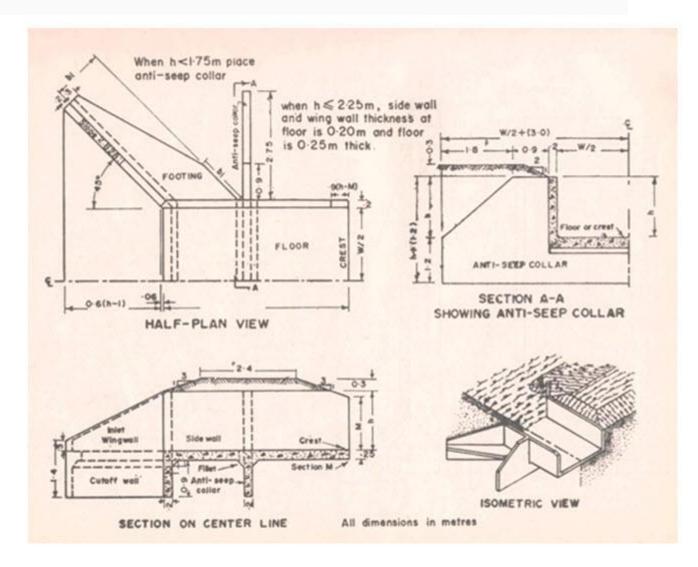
Chute spillway – Inlet details. (Source: Singh et al., 1990)
